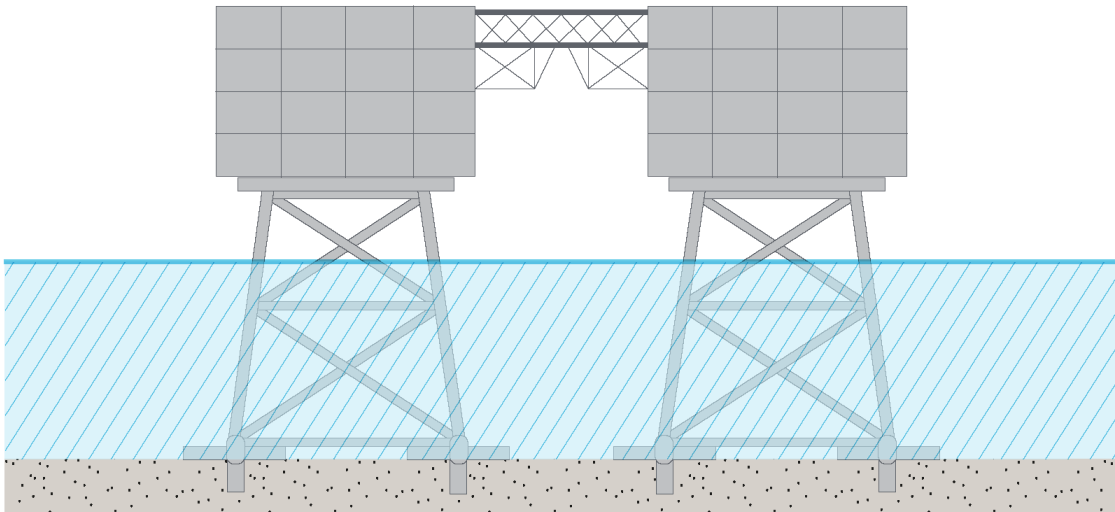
Illustration of typical Offshore Substation Platforms on piled jacket foundations connected by a bridge link (referred to as a bridge linked High Voltage Direct Current Offshore Substation Platform) (singular structure) (not to scale)
